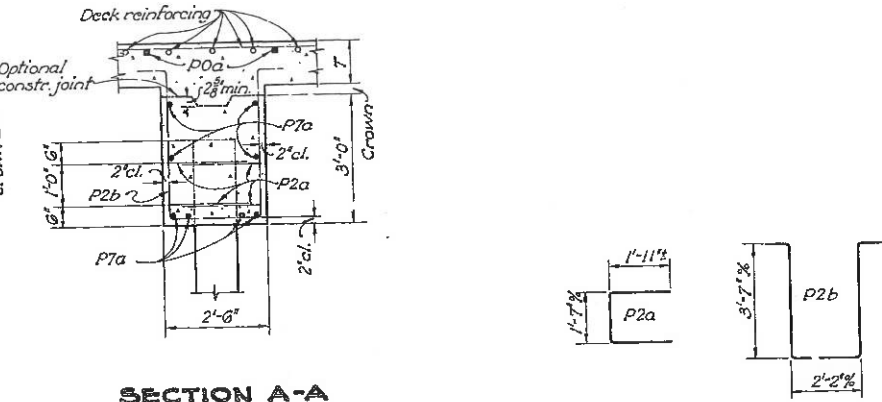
DETAIL OF PILE ENCASEMENT FOR STEEL H OR CAST-IN-PLACE CONCRETE PILES
